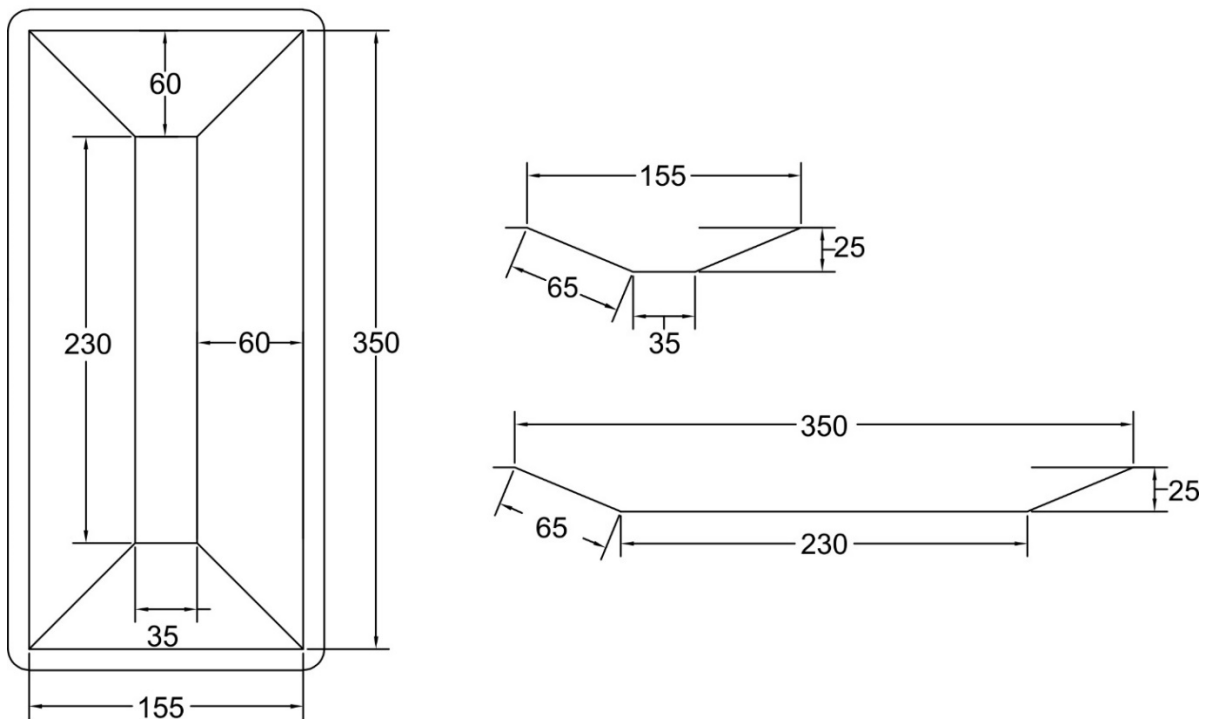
Dimensions of the lined lakes in plan view and cross-section.
